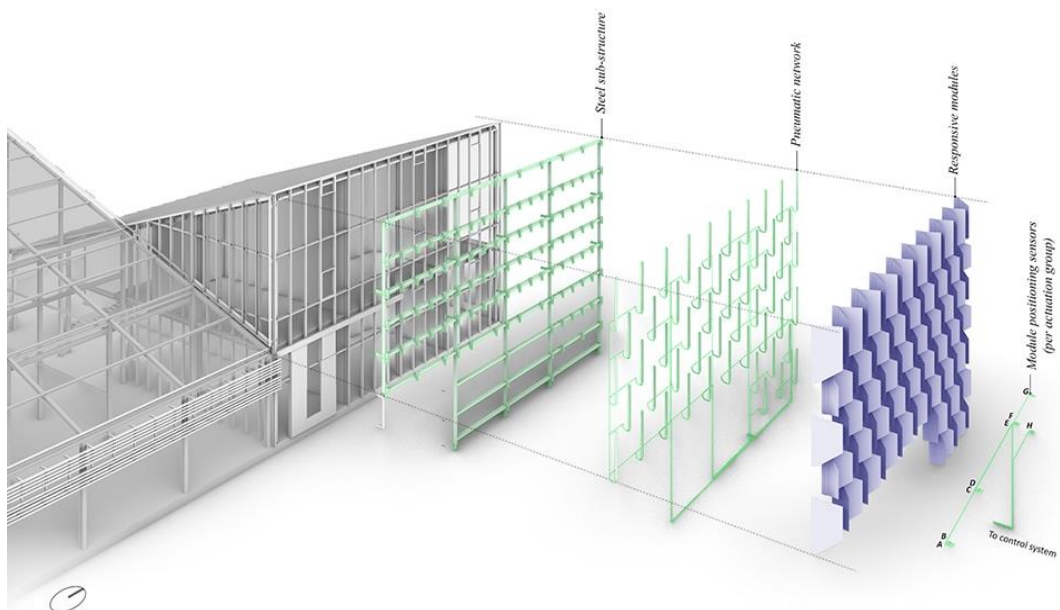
Exploded Façade Components (University of Stuttgart, Institute of Building Structures and Structural Design, 2024).
